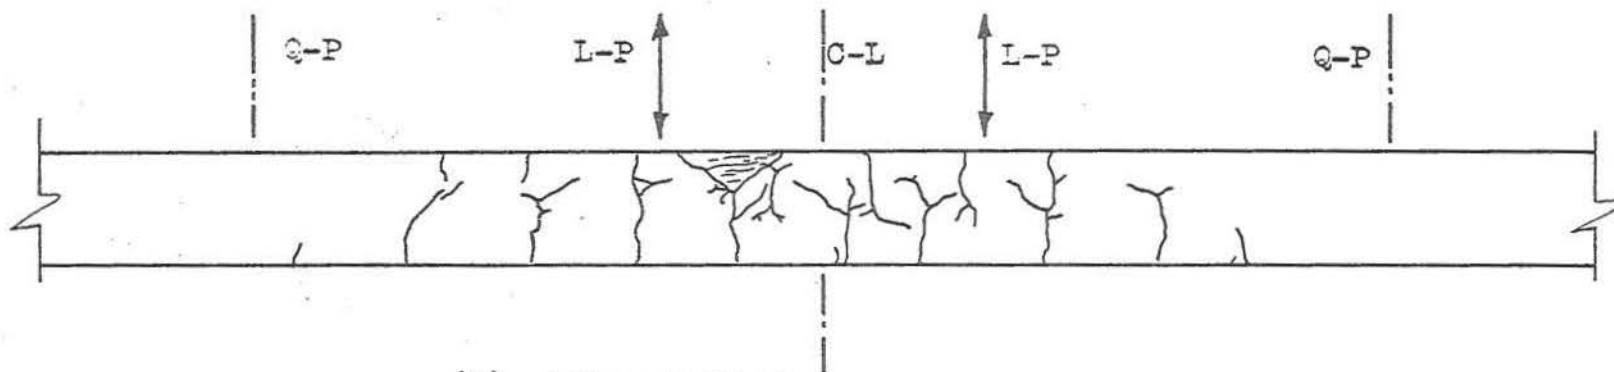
CRACKING PATTERN FOR BEAM 2 (Static test with reversal of loading)
